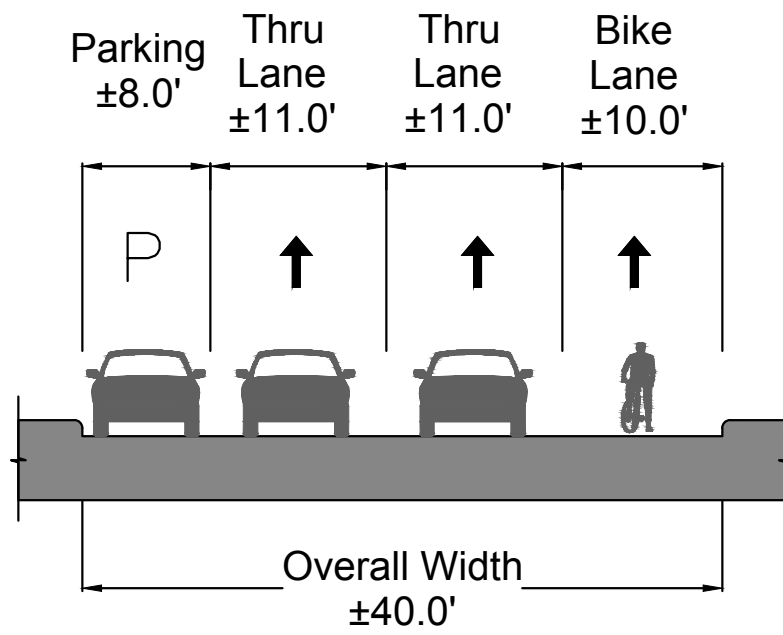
Typical Sections: 4th Street SE between 6th Avenue and 7th Avenue
